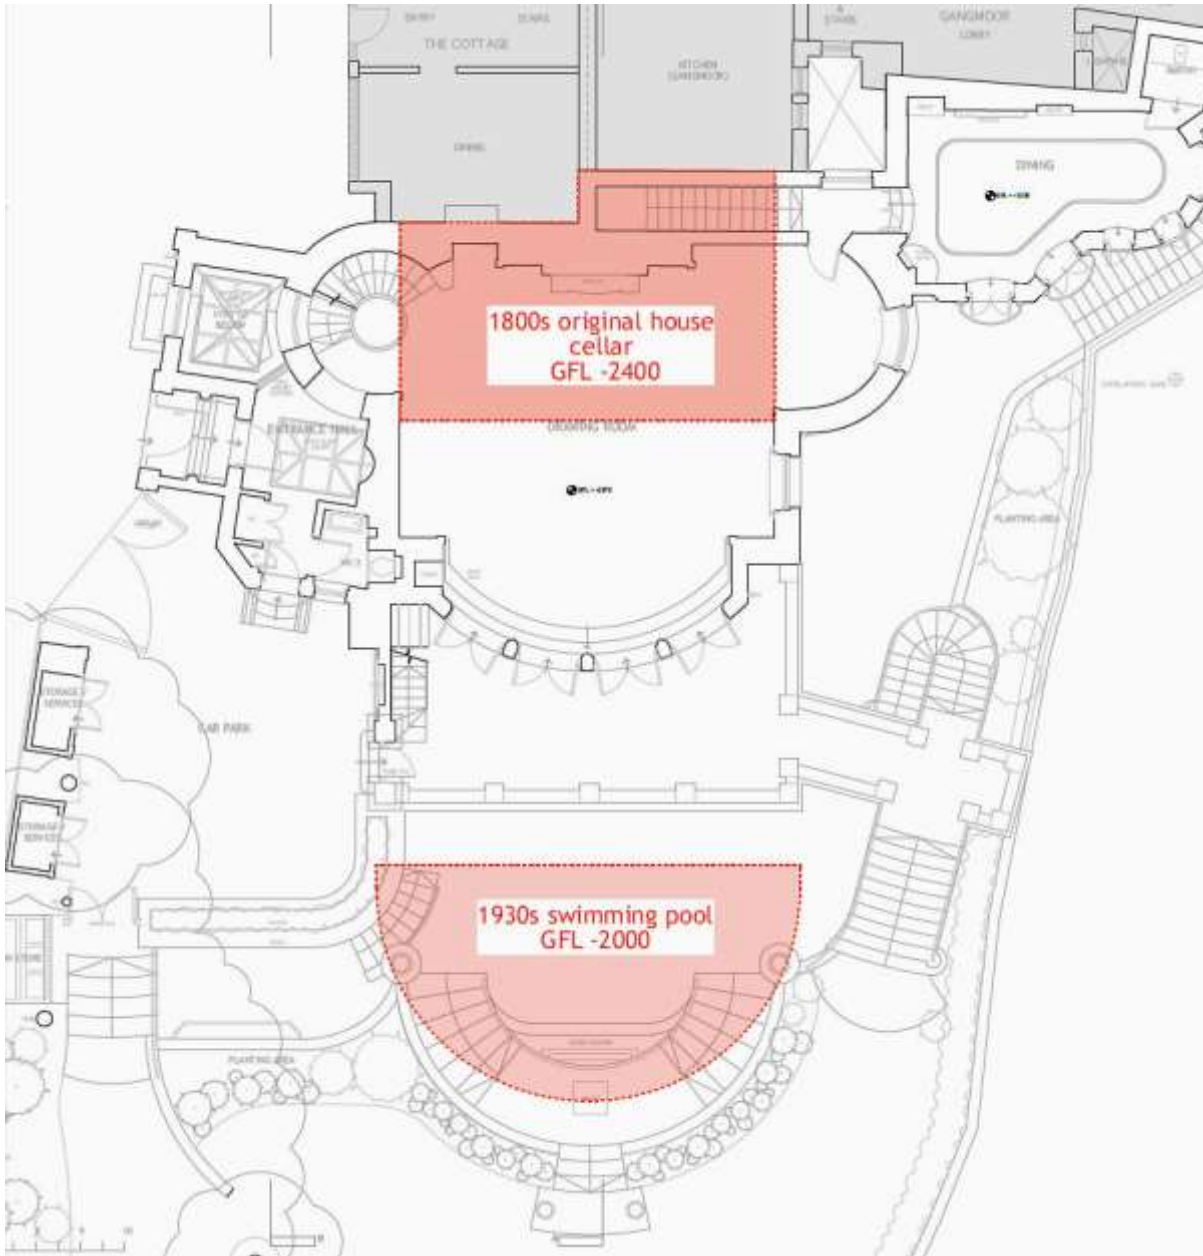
Footprint of original cellar and 1930s swimming pool, shown in pink. Plan provided by Jonathan Freegard Architects (Drawing No. 643-101 original house).
